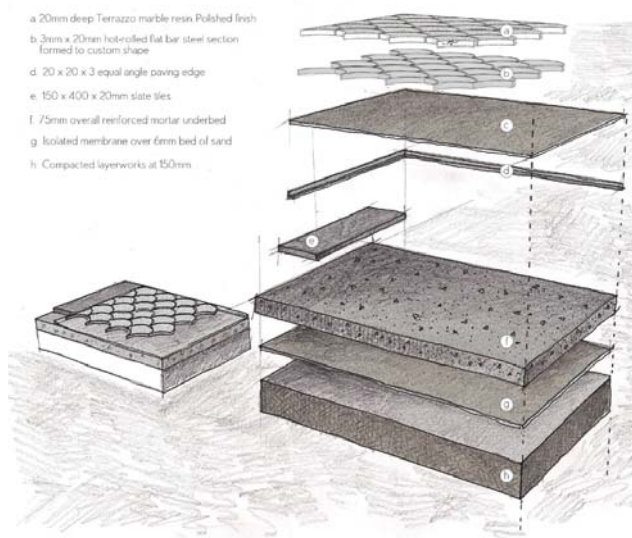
Paving detail 2. Not to scale (Author, 2012).
